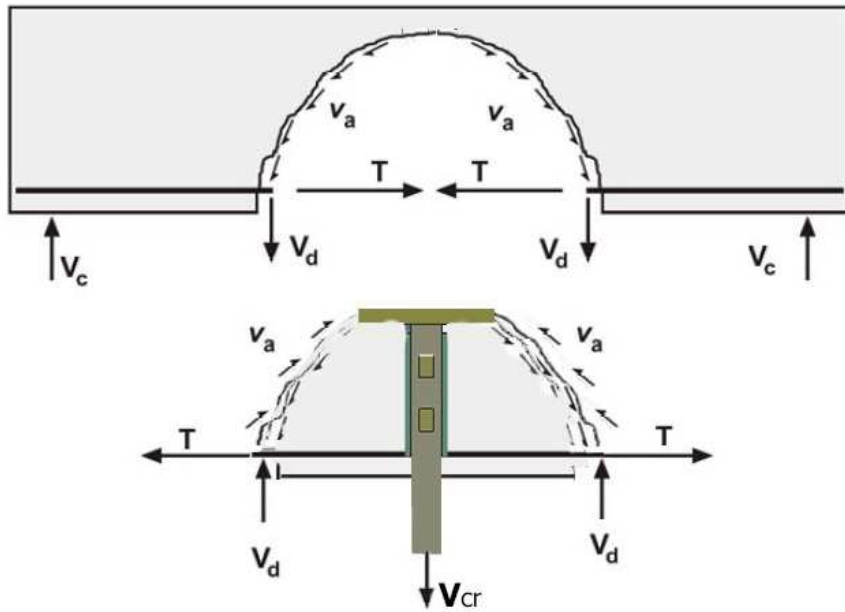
Load transfer mechanism for the connection without transverse reinforcement
